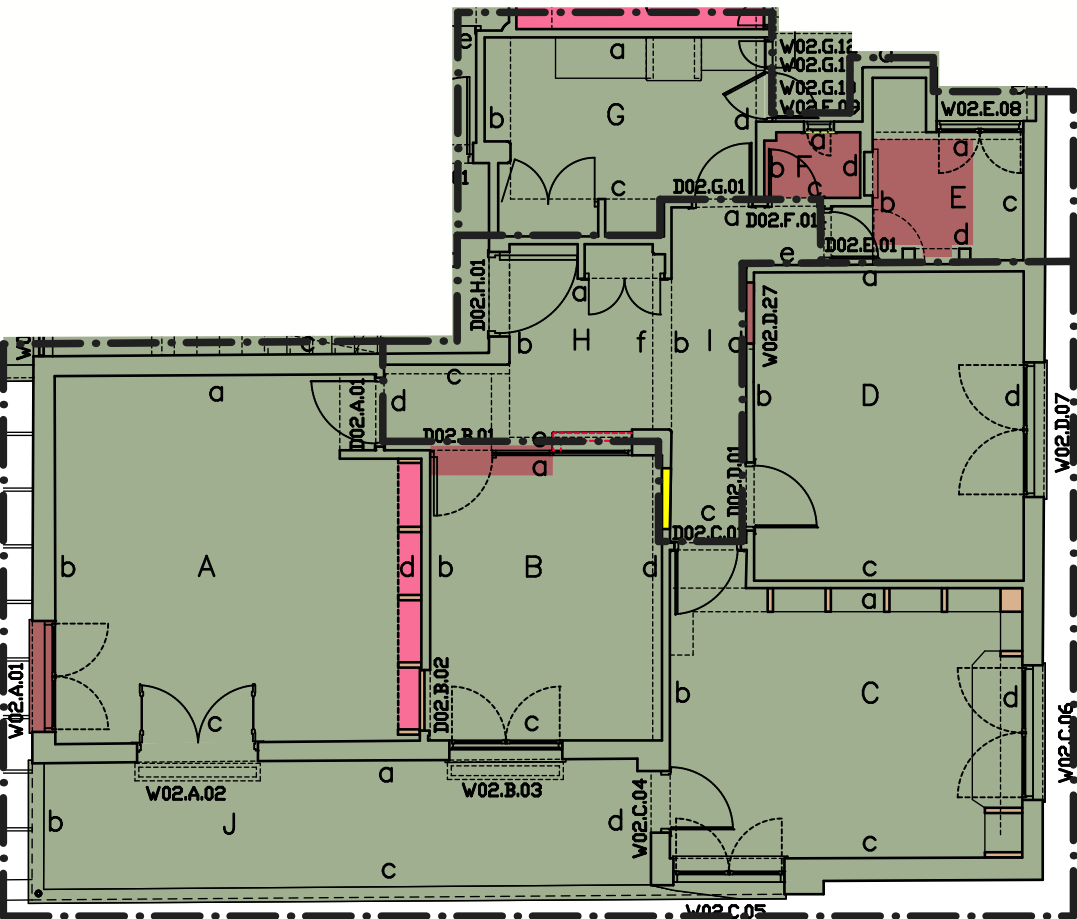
3rd floor, apartment 1, preservation measures, walls and floors
